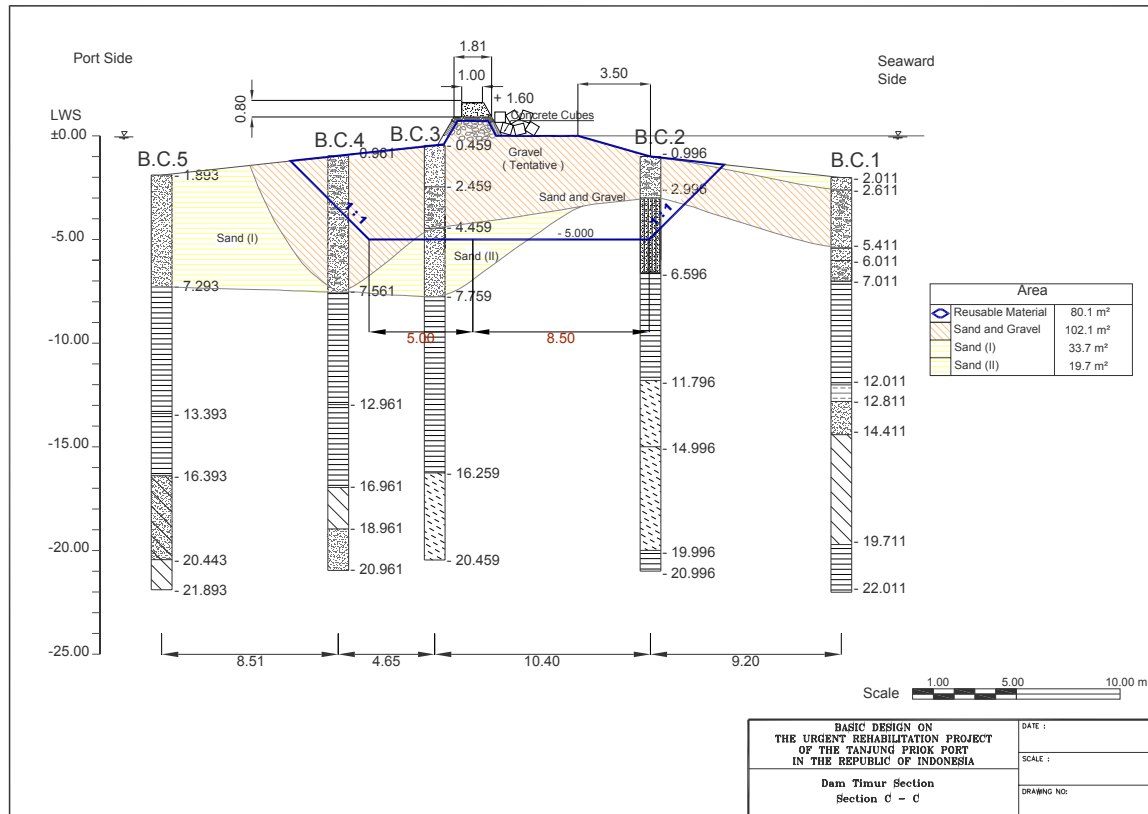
(2) Excavation Section shown with Boring-Log in the Segment 2
